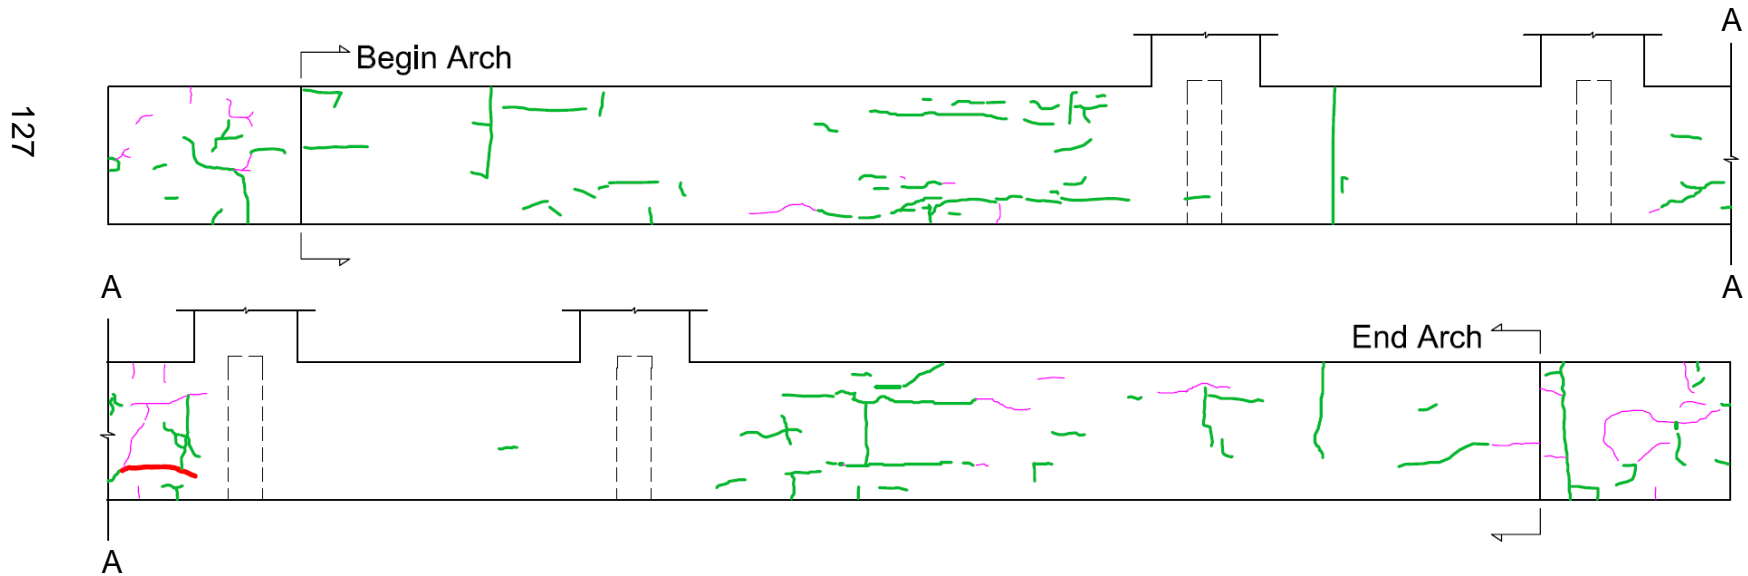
Crack mapping, November 2010, Span 4 – South Arch – Plan View
